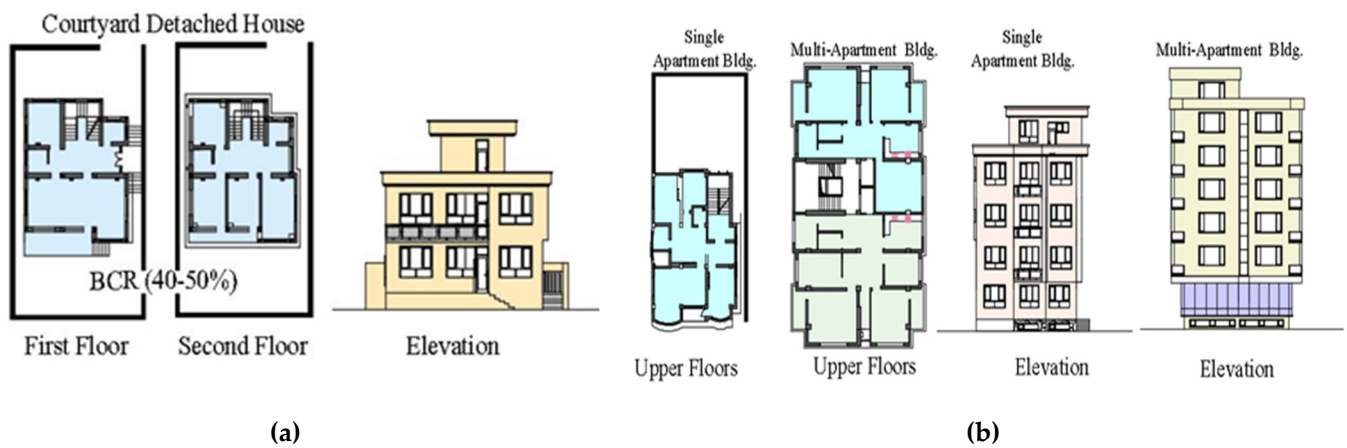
Existing types of buildings layouts in Study Areas; (a) detached house scheme designed for low rise residential neighborhoods; (b) transformed scheme of houses with single type apartment buildings and multiple apartment buildings.
